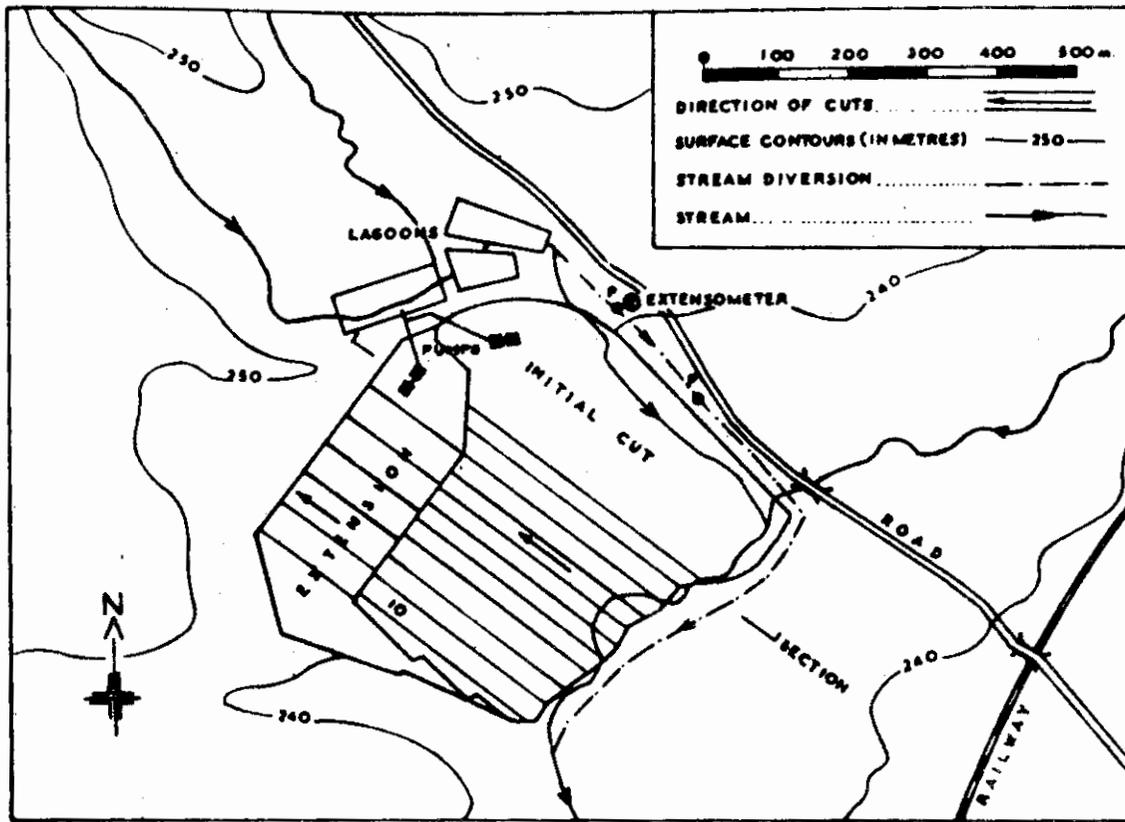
HAYWOOD LOCATION PLAN AND SECTION
